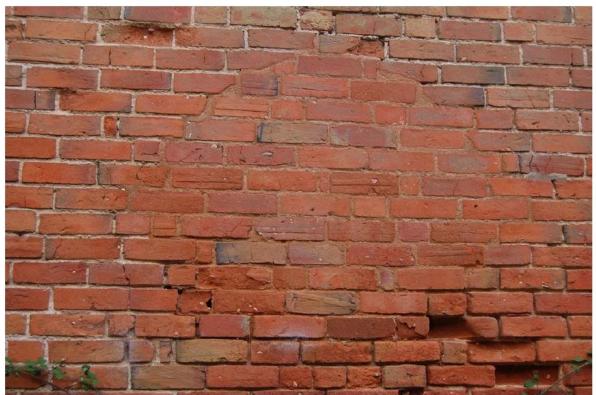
South range, west elevation; detail of blocked window (?semi-circular arch).
